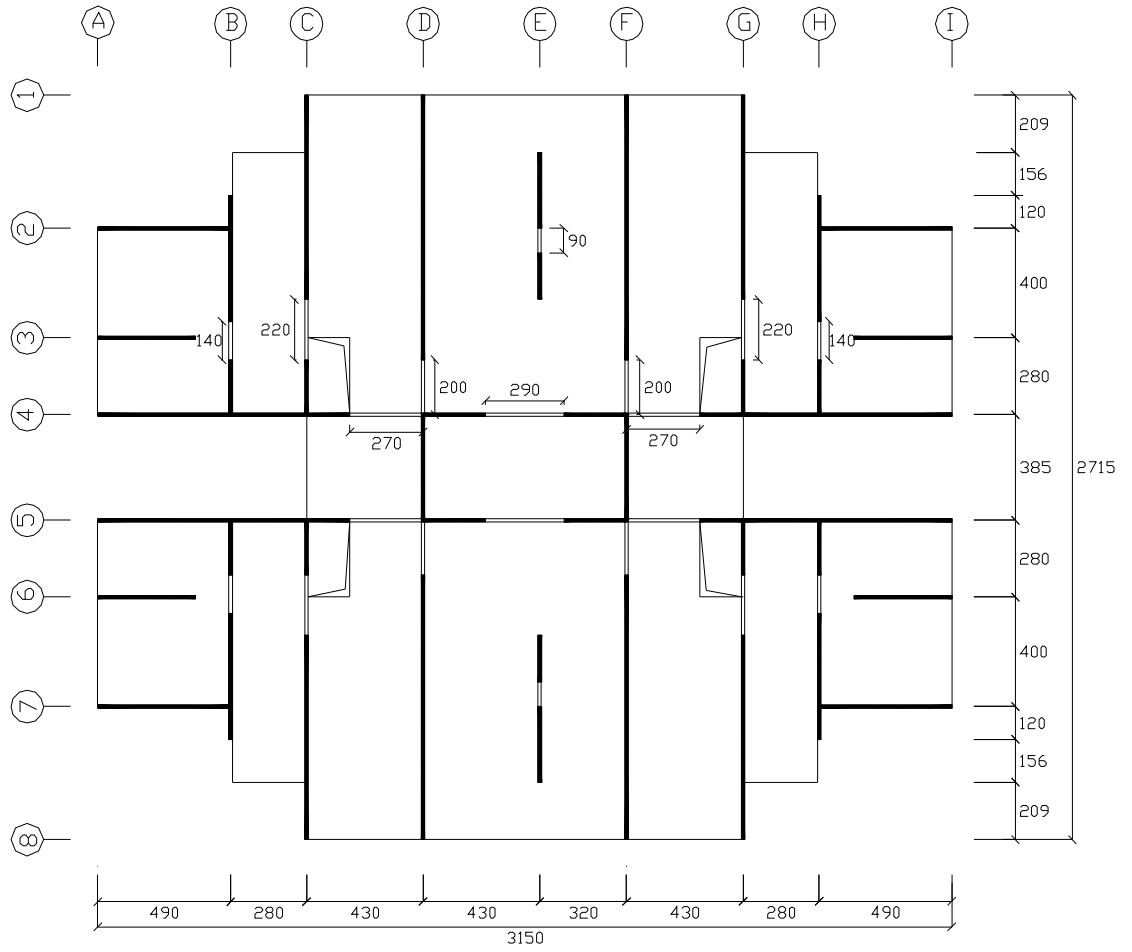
Typical plan view – Plan No. 12 (units in cm)
